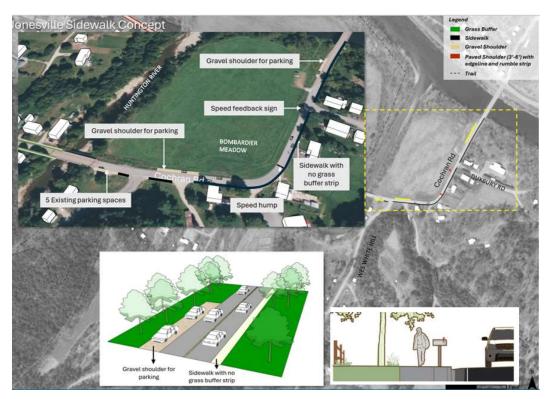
Jonesville Sidewalk Concepts and parking east of the Huntington River
